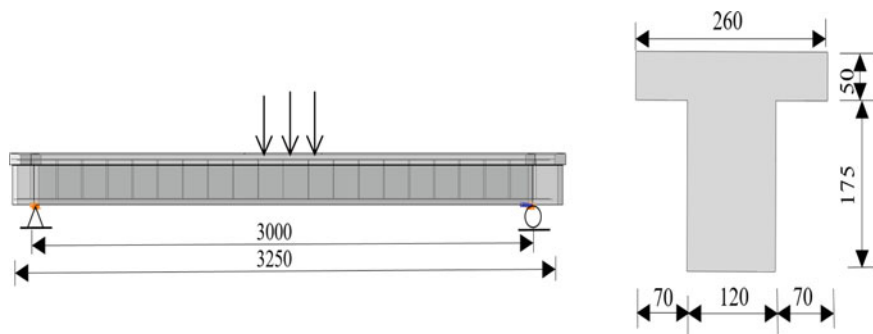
Geometry and sectional dimensions of the T-beam with loading arrangements
